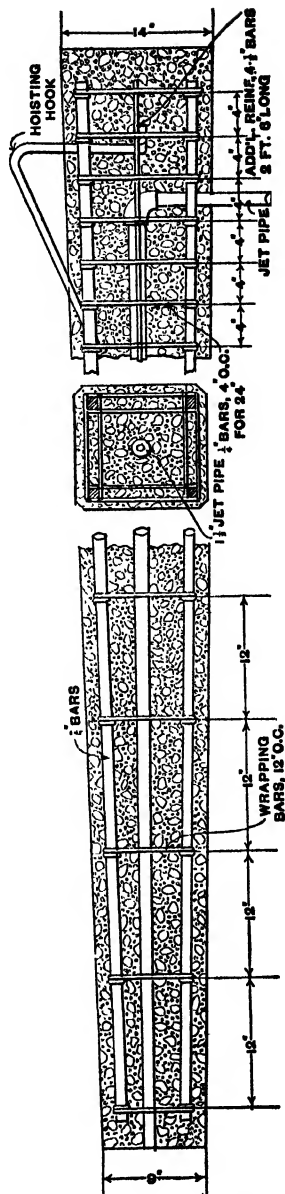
Piles used at Cambridge, Mass. (See p. 651.)
